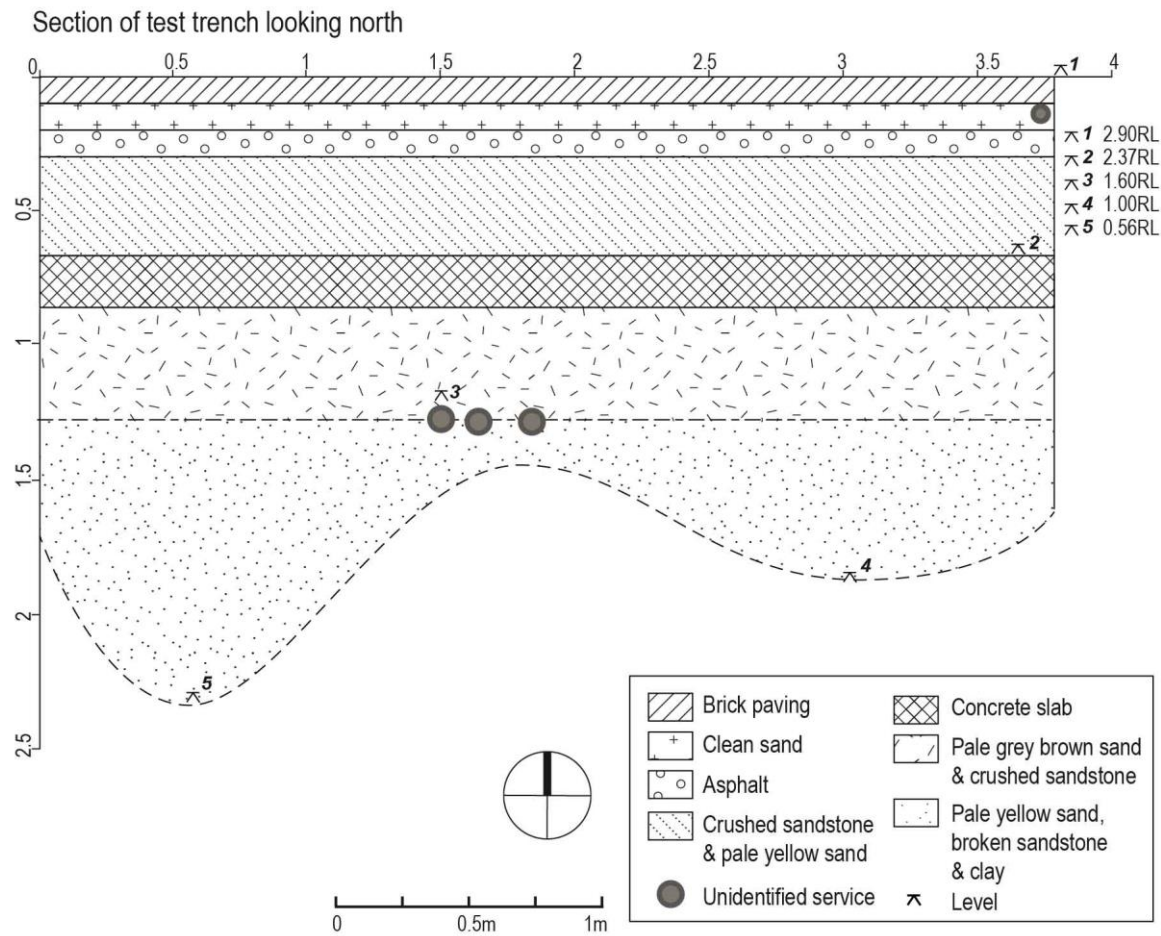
Section drawing of the south-facing section. (Source: GML)
